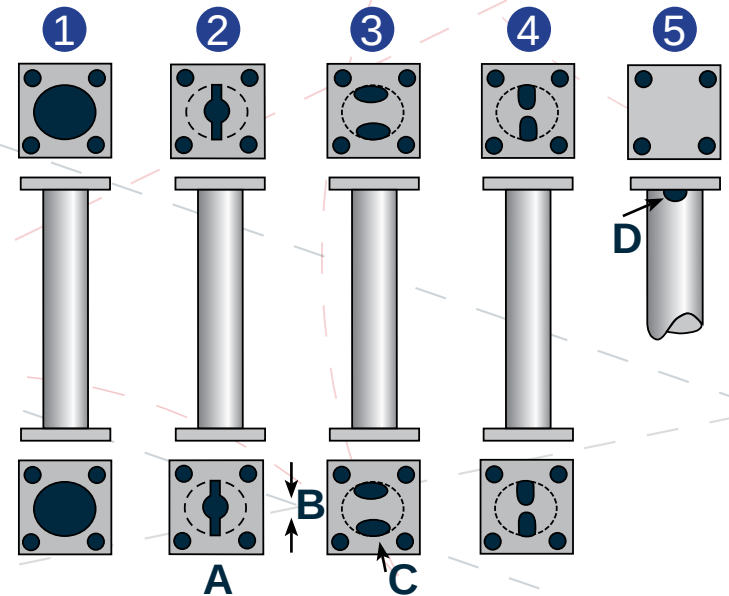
Pipe columns, pipe girders, street light poles, and transmission poles
